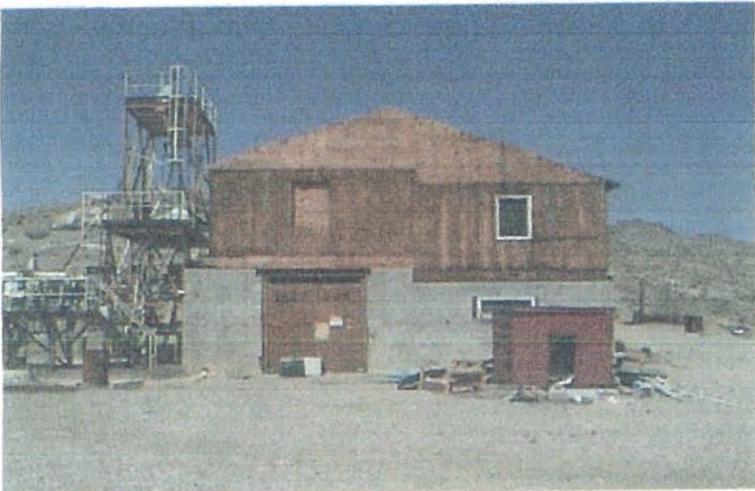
Taken 7/26/00 by J. Mur. Looking west at building on Eagle 1 claim. Compare with photo 10.
